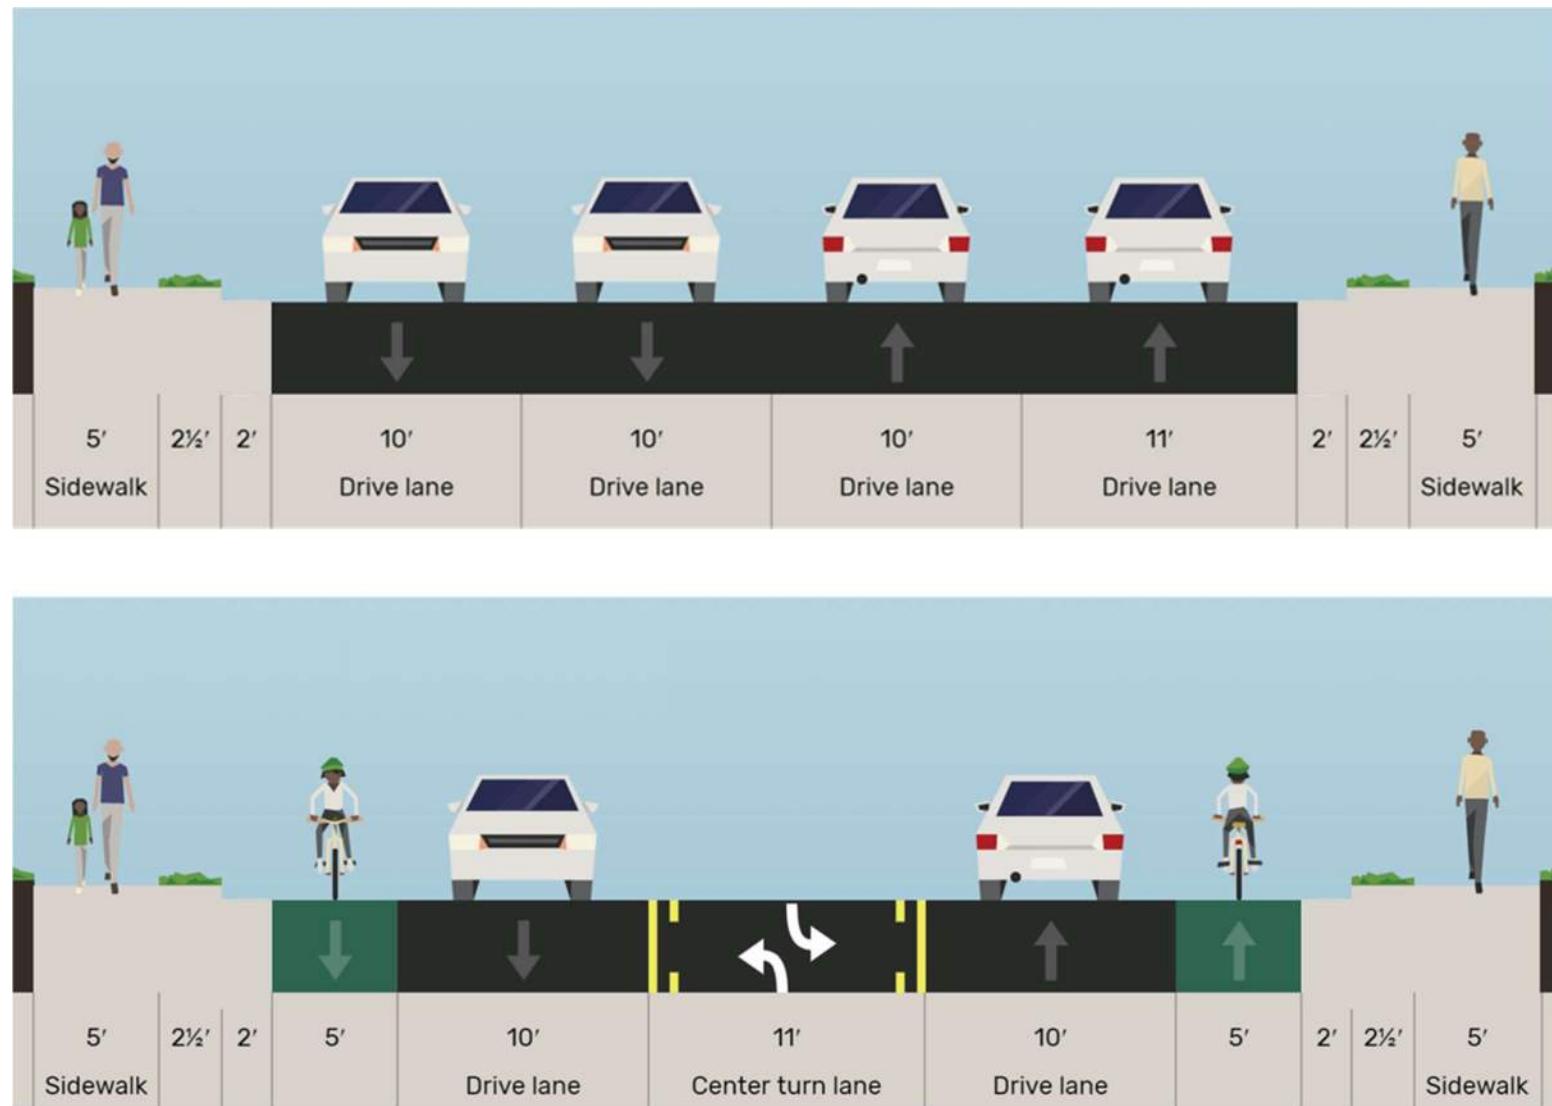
Gay Street, East of Main Street - Existing (Top) and Proposed Road Reconfiguration (Bottom)
